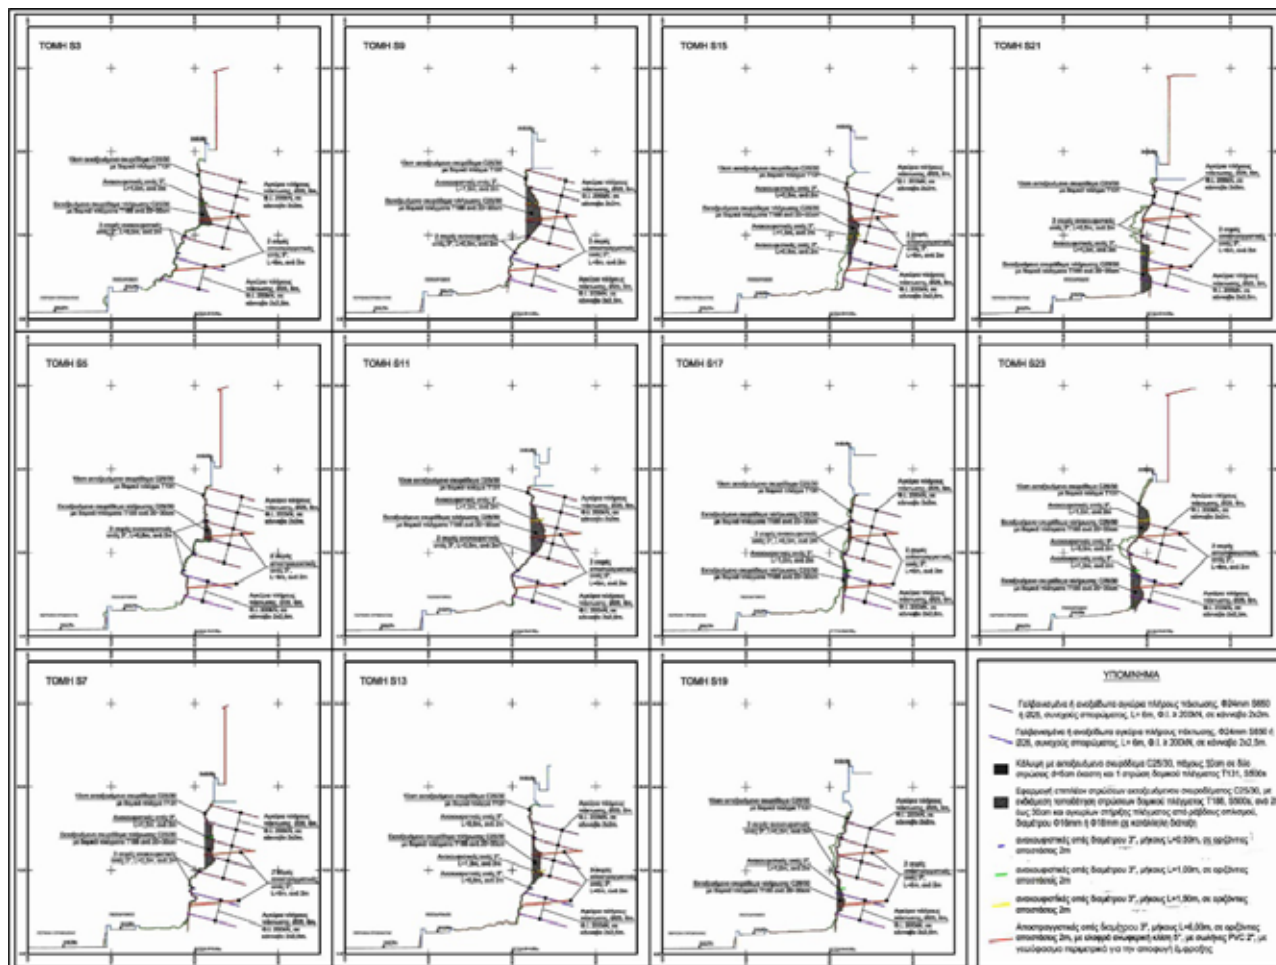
Cross-sections of the failed slope showing the support and protection measures.
